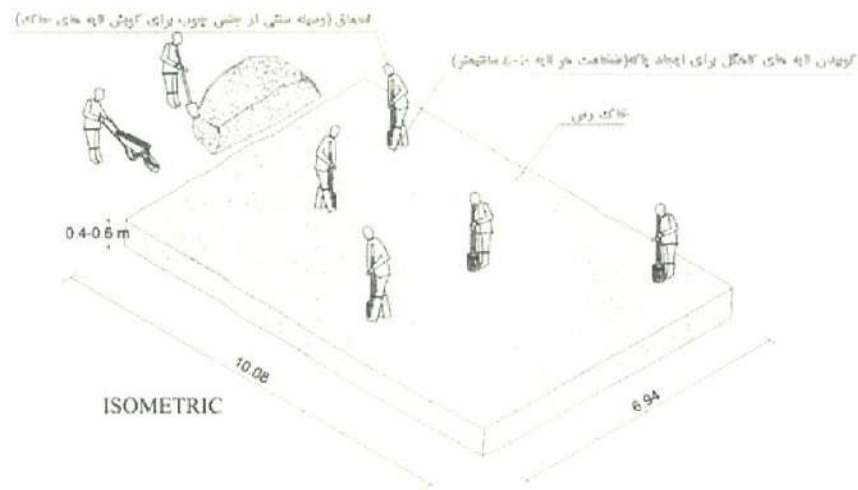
Construction of a mud-made platform to receive the wooden foundation
